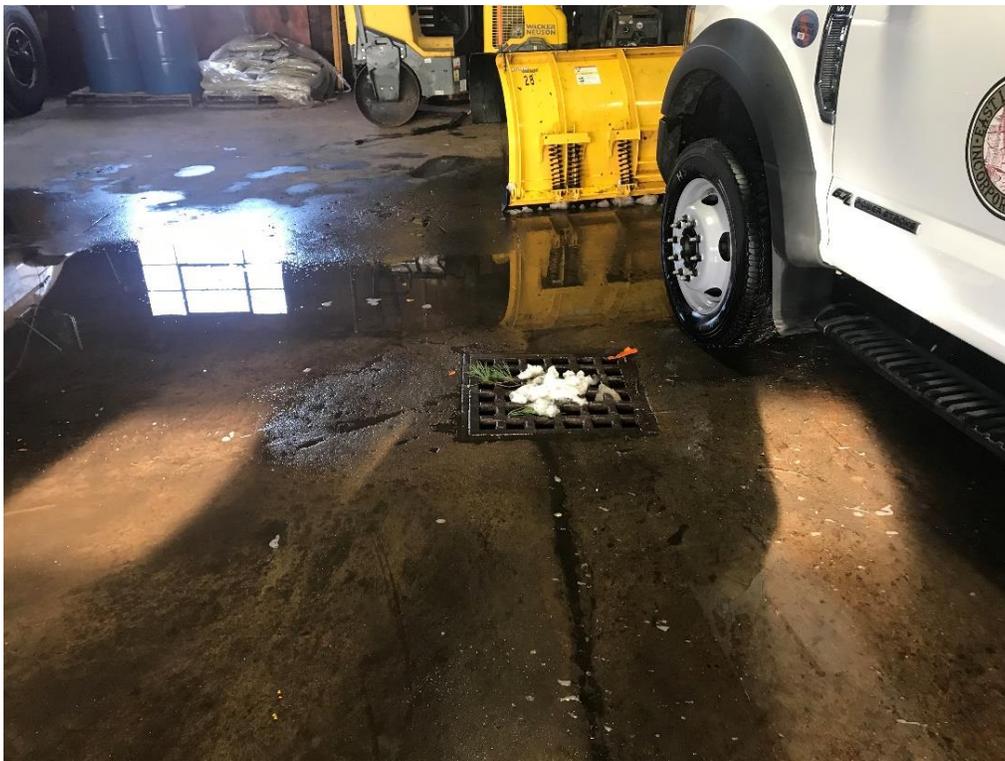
Floor drain inside the DPW Service Building (December 5, 2019).
